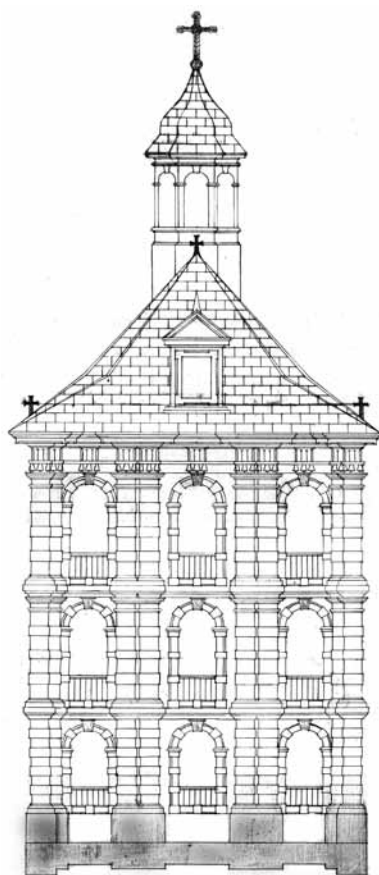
Simon Pitz (attributed to), design for a building, elevation, AKJK, photo: K. Blaschke
